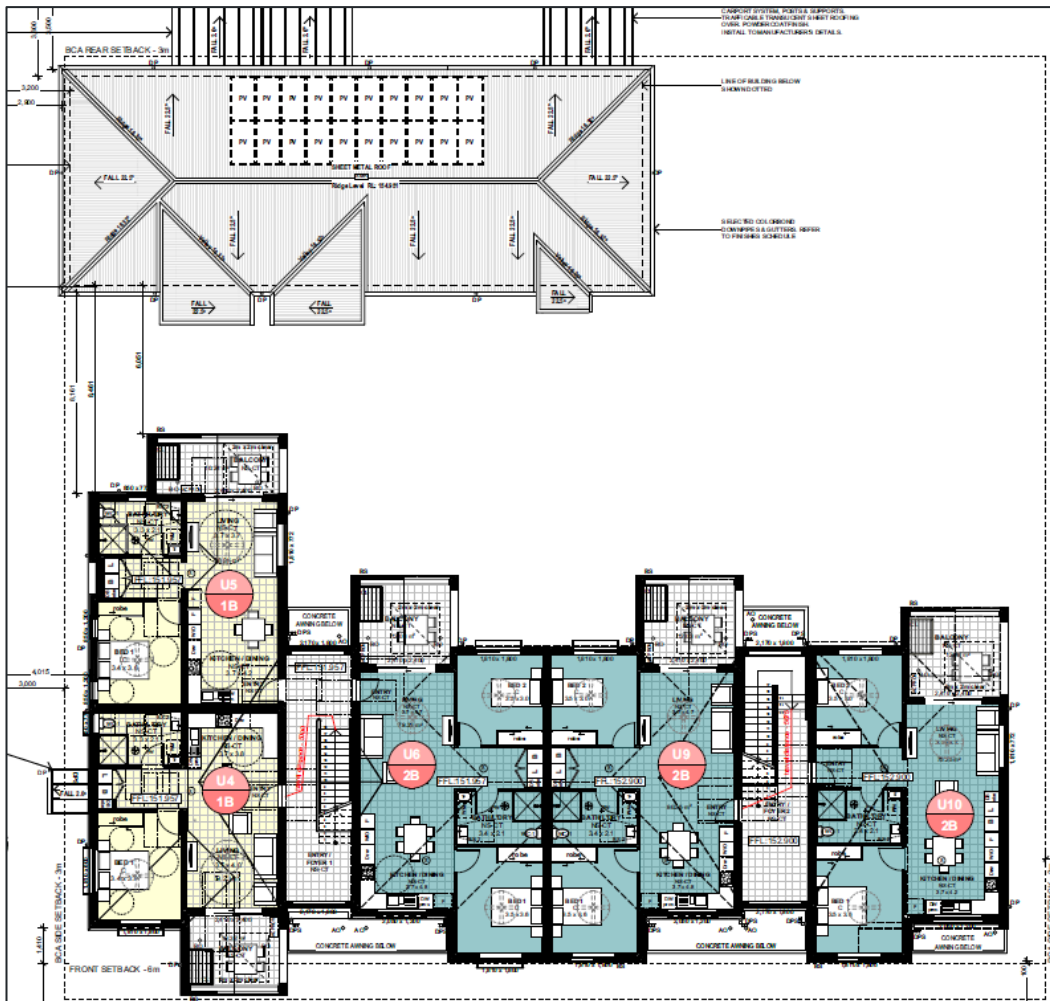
Site and Ground Floor Plan (Source - DTA Architects 2024)
